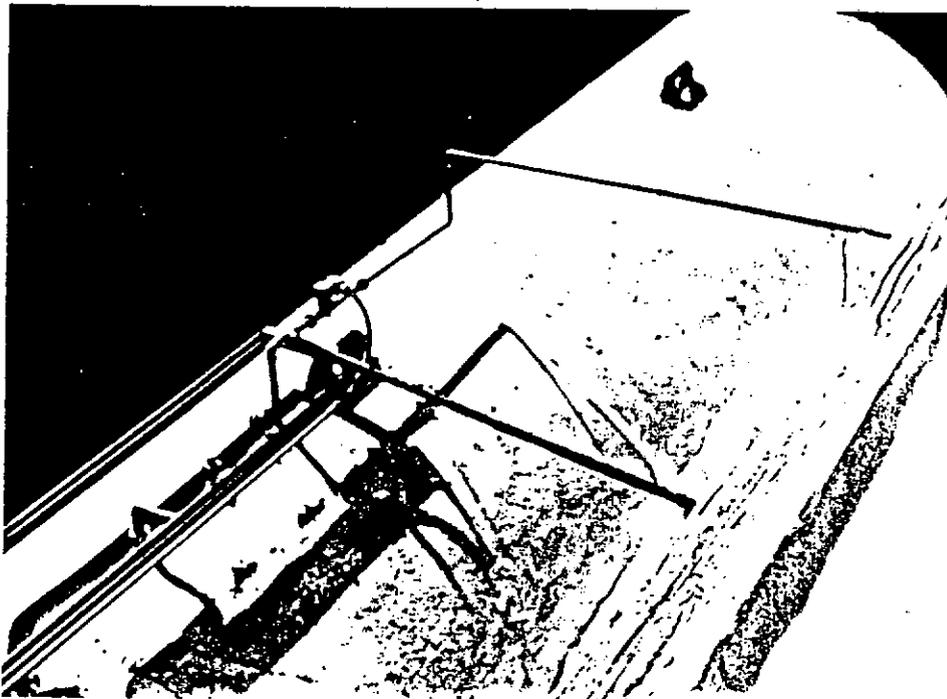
Penthouse Mechanical Area: Top View of Damaged Water Storage Tank Insulation.
